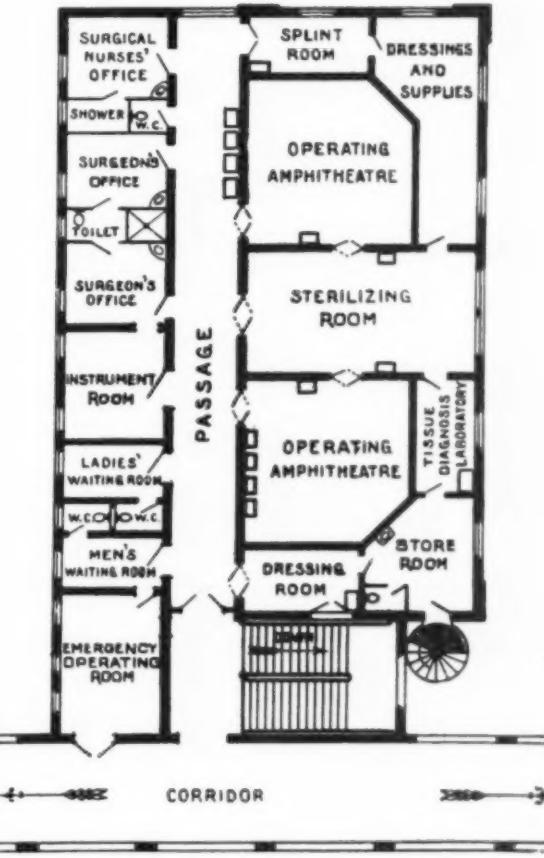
Physical therapy, clinical laboratory, and operating pavilion. Second floor plan.
